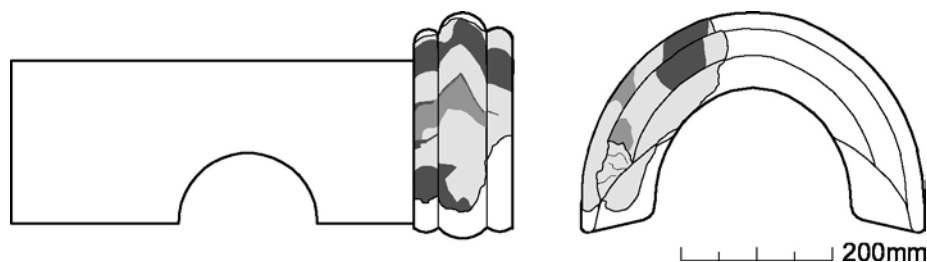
Reconstruction drawing for the ridge tile associated with roof 1. Reconstruction is based on VIN 618.
